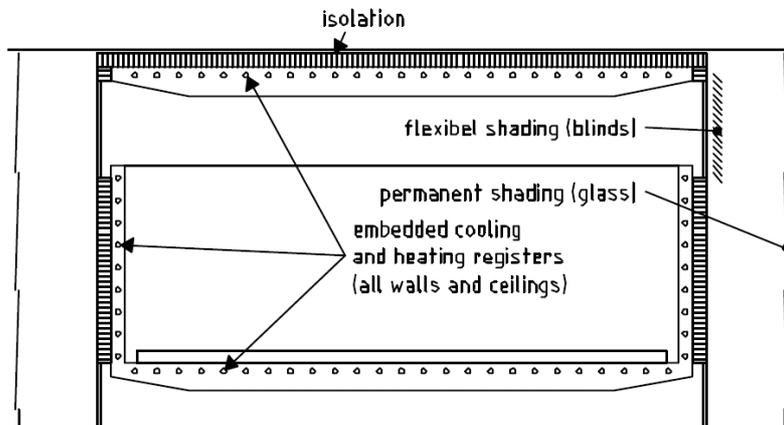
Cross section of the building with activated concrete slabs and walls (Annex44 2007)
